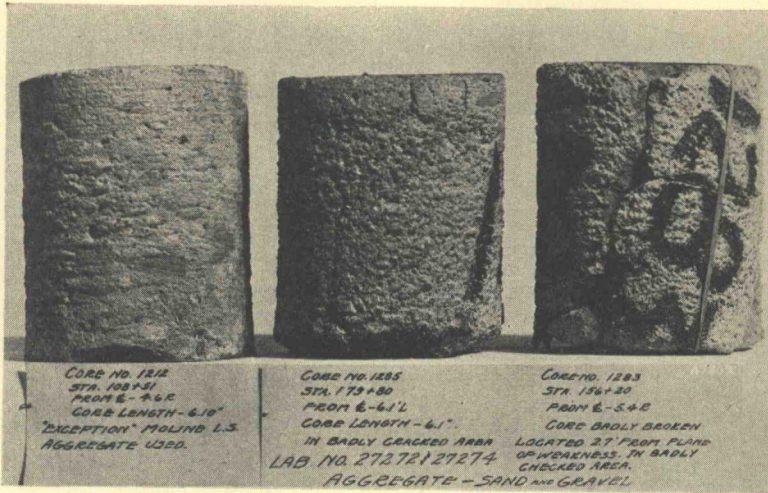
Cores from Cracked Sand-Gravel Pavement
